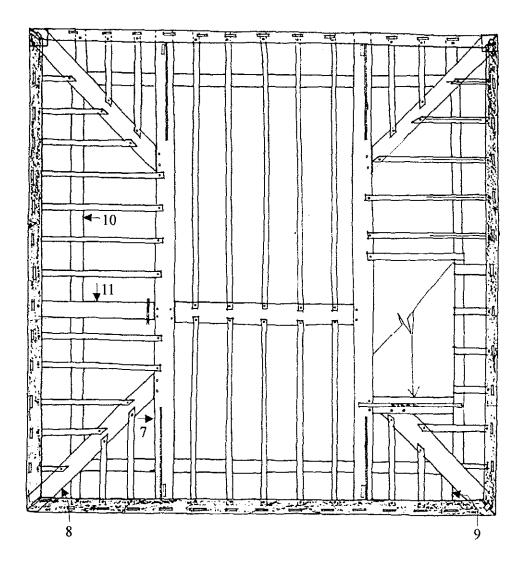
Lower Brockhampton Gatehouse: Plan of first-floor beams, joists and bressumers showing location of samples. Based on drawing by Wheatley Taylor Stainburn Lines, Chartered Architects
